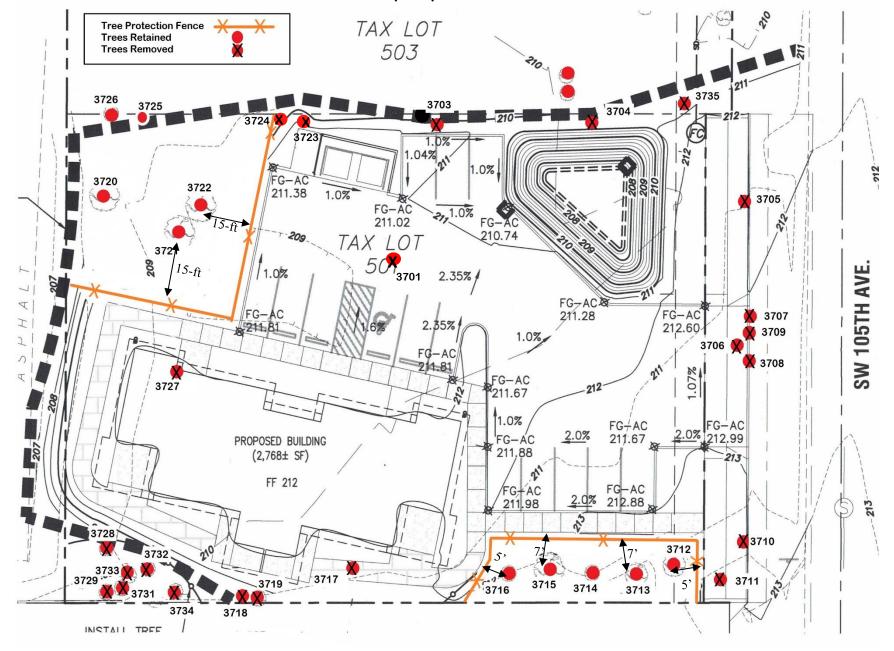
Tree Plan & Tree Protection Plan (Site)
